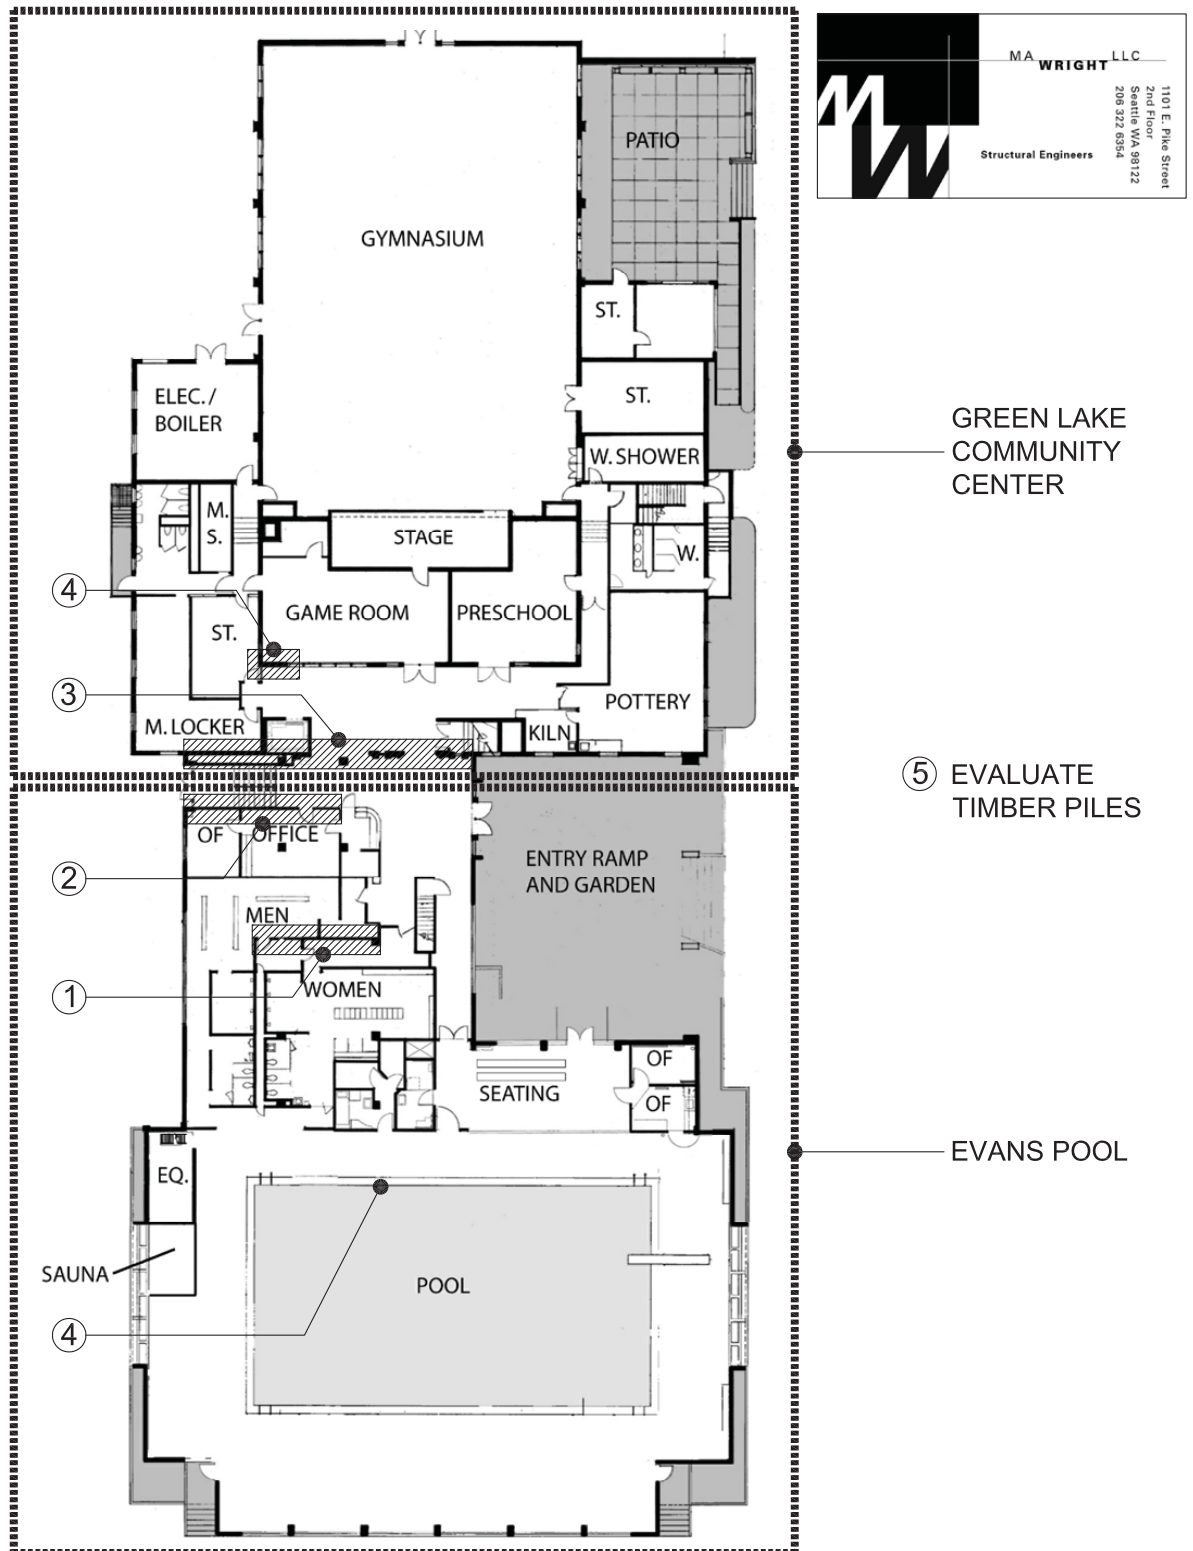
Green Lake Community Center / Evans Pool - First Floor Plan
